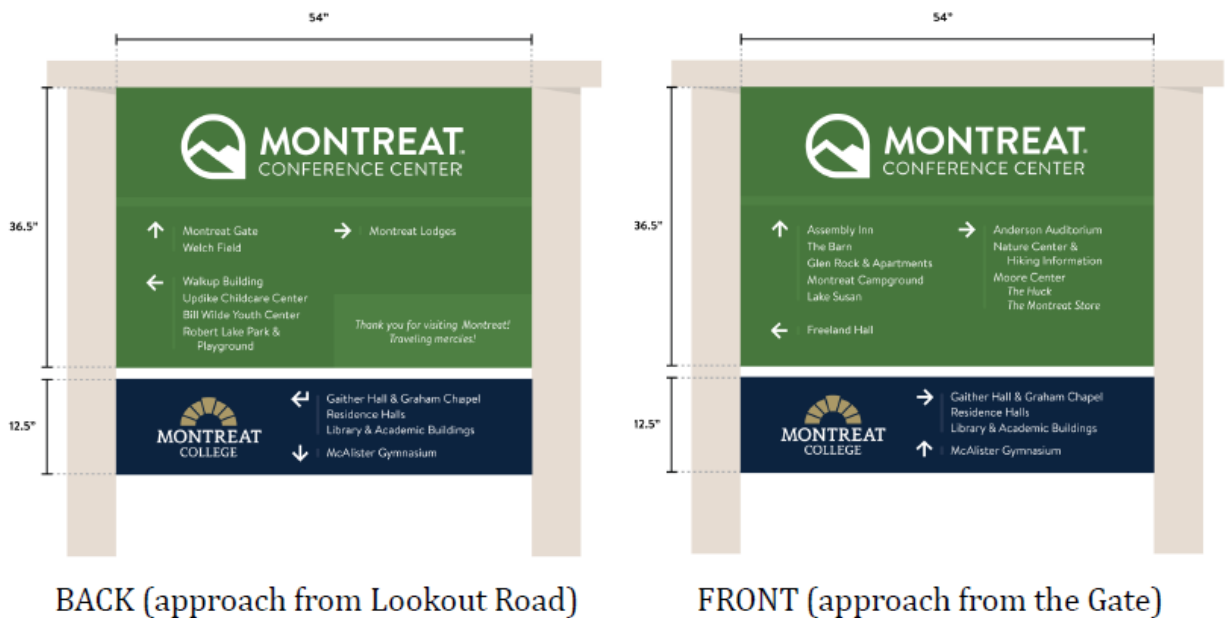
Proposed Wayfinding Sign (provided by Applicant)
